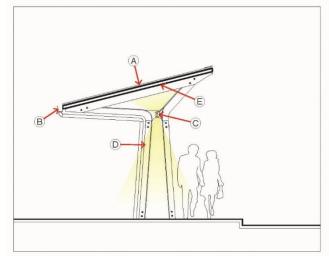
Transit canopies typical section and North Transit Canopy section
